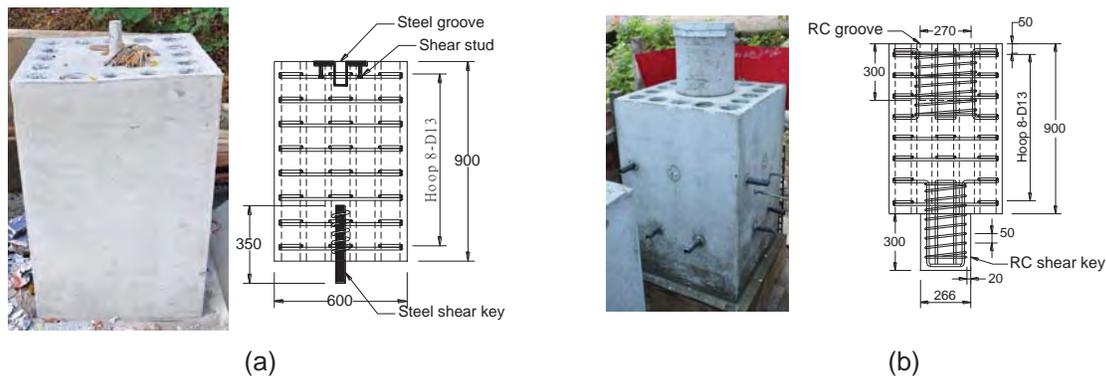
Design details and photo of shear keys: (a) steel dowel shear key; (b) RC shear key
